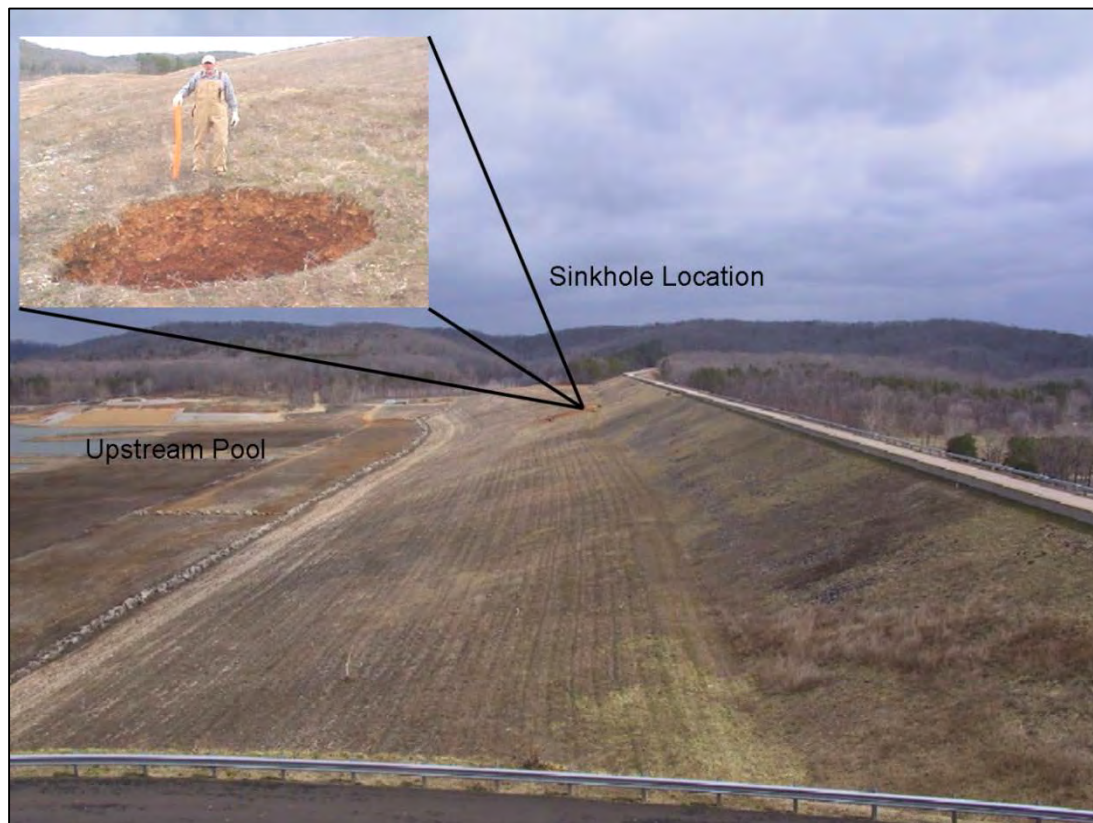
Sinkhole that developed on the upstream face of a dam due to piping and internal erosion of the embankment into the foundation.
